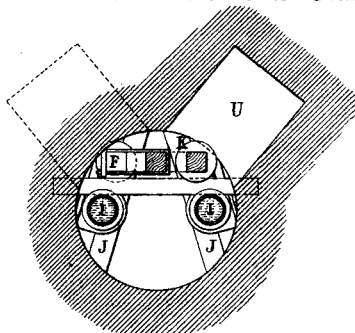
Sectional Plan of Pit at Gland of Plunger Pump.
